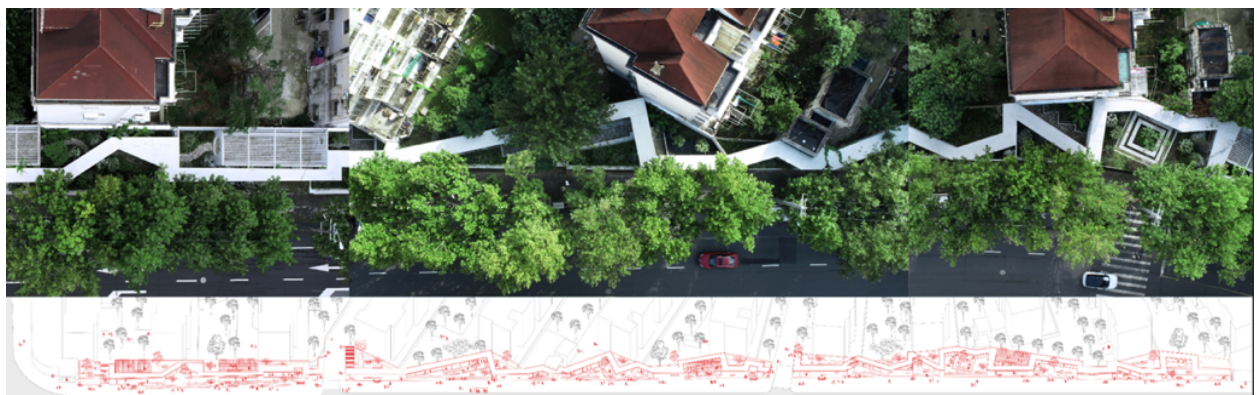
Changli Garden (Source: China Pavilion at the 18th Venice Biennale of Architecture)
